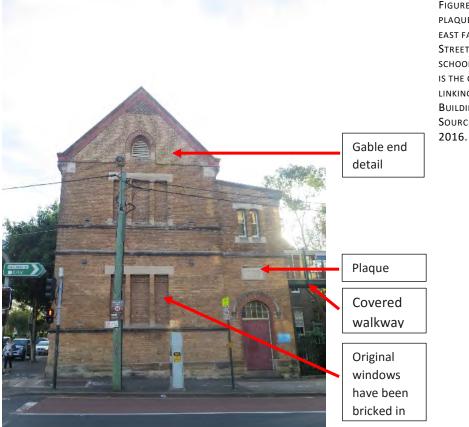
VIEW SHOWING THE PLAQUE AS SEEN ON THE SOUTH EAST FAÇADE ALONG CHALMERS STREET WHICH READS, "GIRLS SCHOOL 1891". ALSO SHOWN IS THE COVERED WALKWAY LINKING BUILDING 1 AND BUILDING 2 SOURCE: OCP ARCHITECTS, 2020
